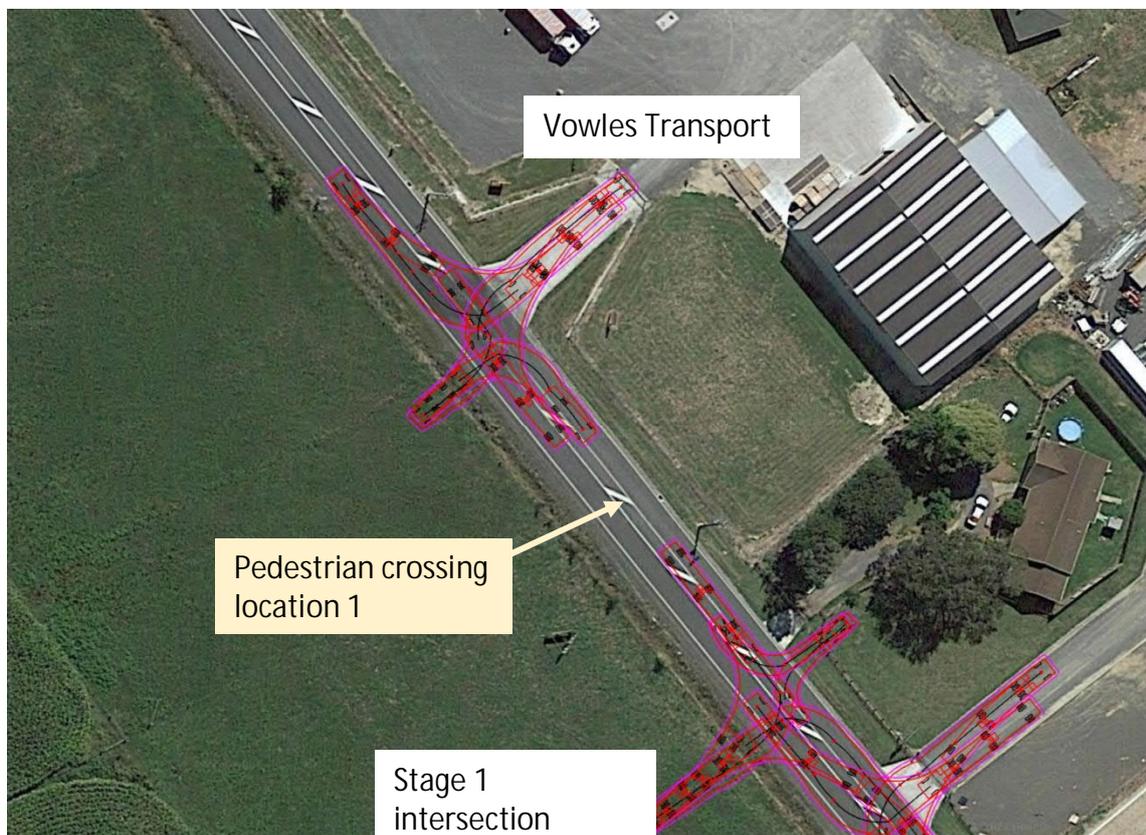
Avenue Road North pedestrian assessment – Vowles Transport to Stage 1 intersection
